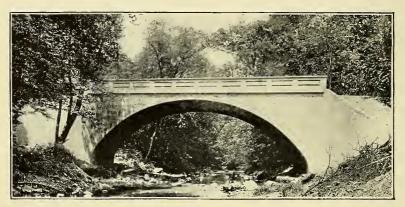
Reinforced Concrete Arch, 55-ft. Span, built in Montgomery County, Maryland, under supervision of State Highway Commission.
